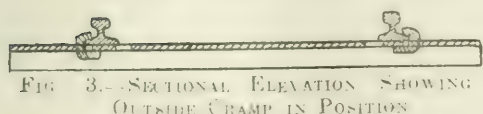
SECTIONAL ELEVATION SHOWING OUTSIDE CRAMP IN POSITION
